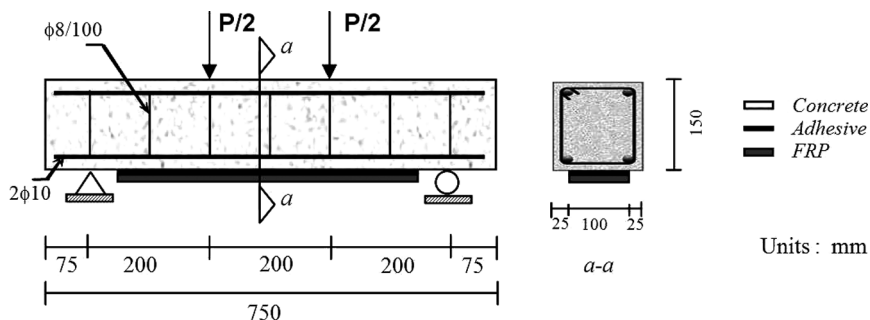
Loading, boundary conditions, and geometric dimensions of reinforced concrete (RC) beam with FRP.
